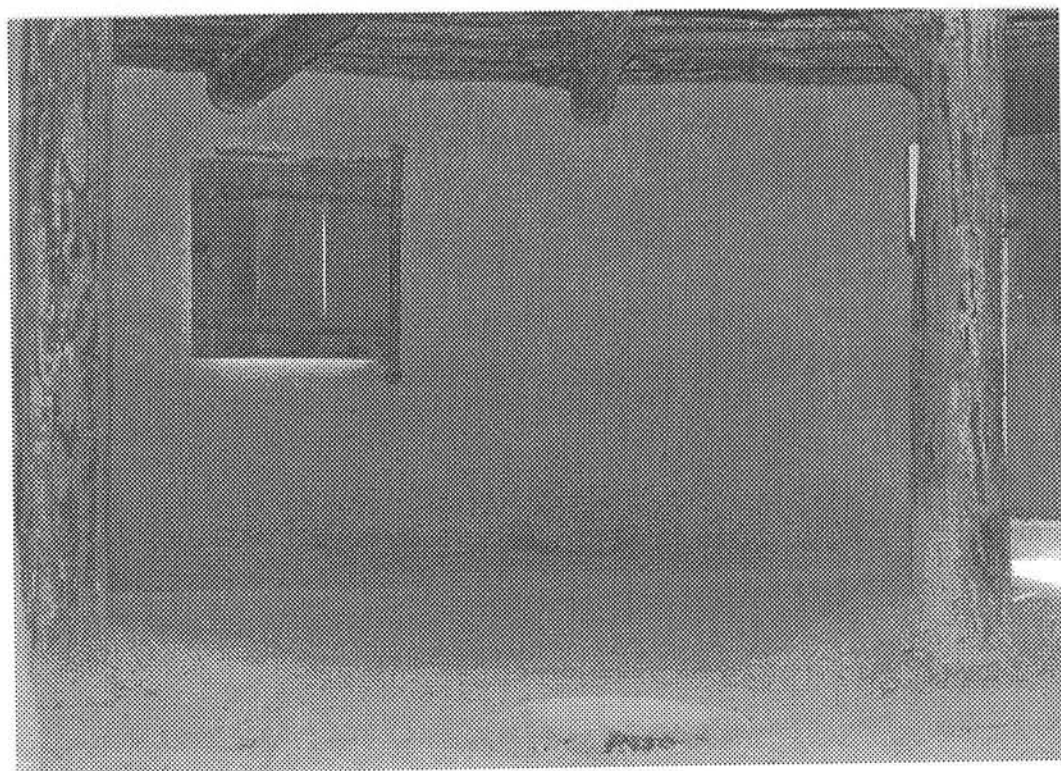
LEV, interior of RH1 with completed floor, wall plaster and hearth.
